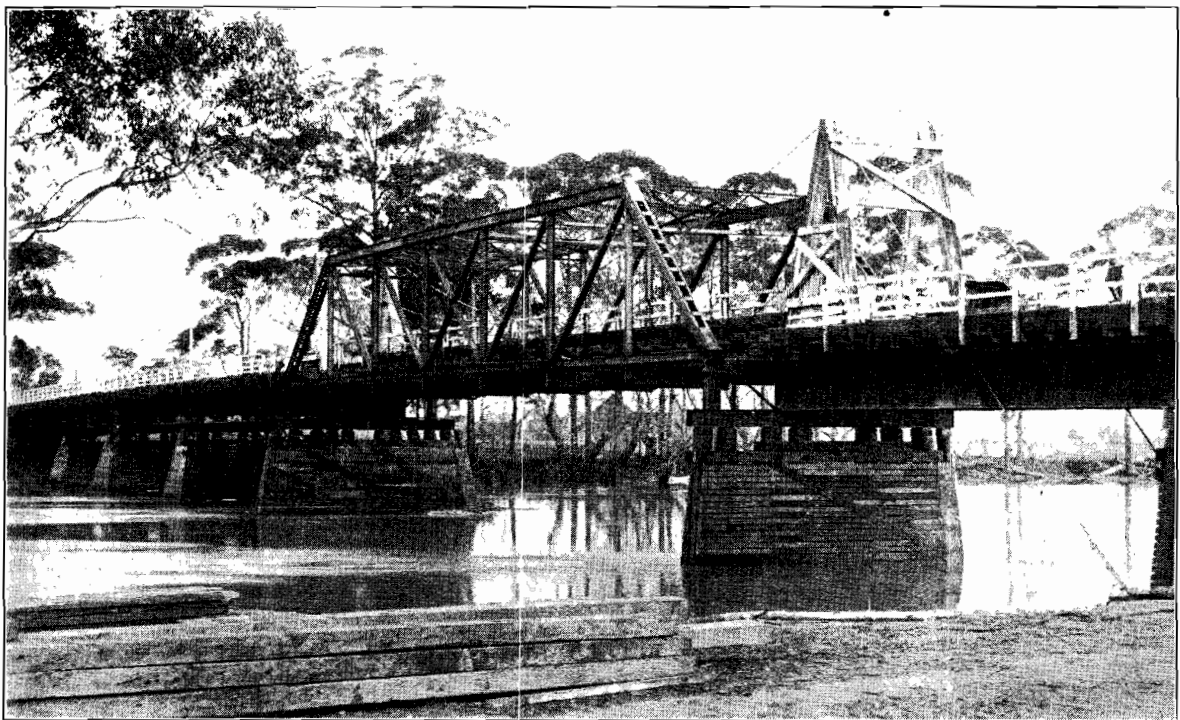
New steel truss span erected on bridge over Snowy River at Orbost in place of two spans destroyed by floods.
